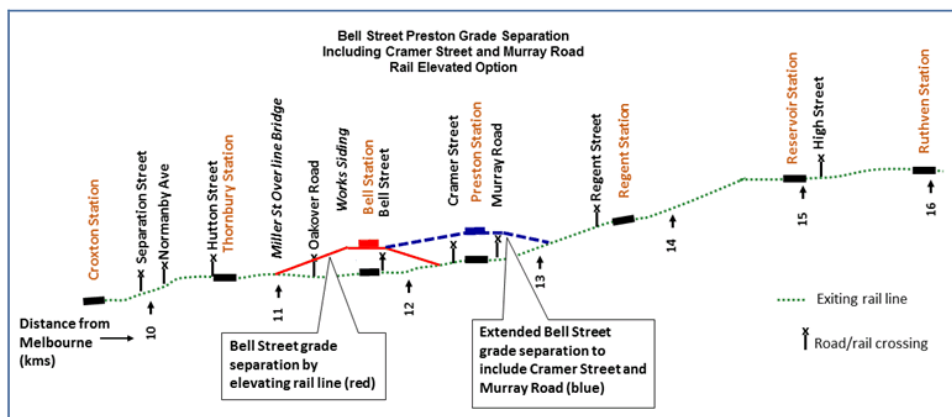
Bell Street base case extended to Cramer St and Murray Rd—elevated rail
